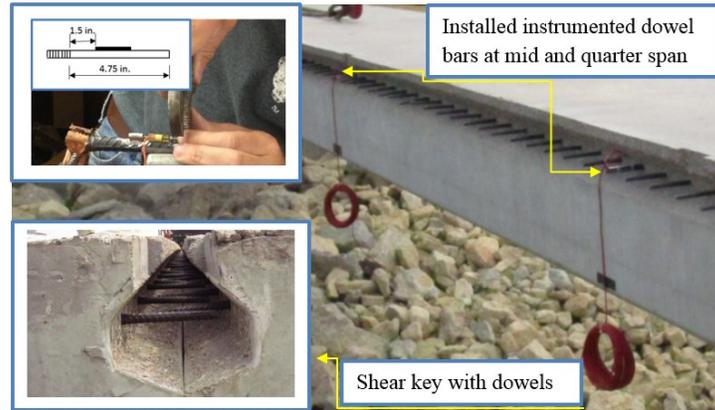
Instrumented Dowel Bar and Dowel Bar Covered with a Protective Shield, (all dimensions in inches, 1 in. = 25.4 mm)
